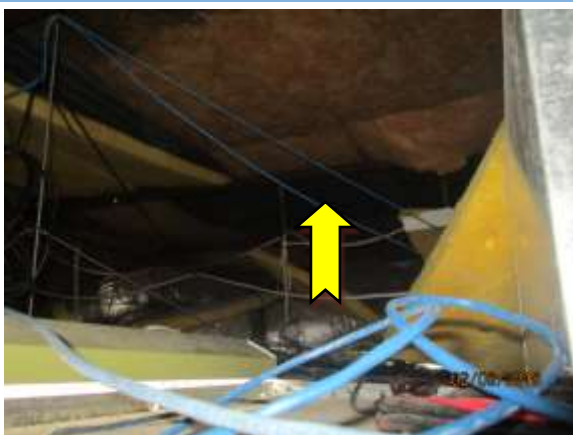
Level 1, throughout underside of roof – suspected SMF-containing sarking insulation.
